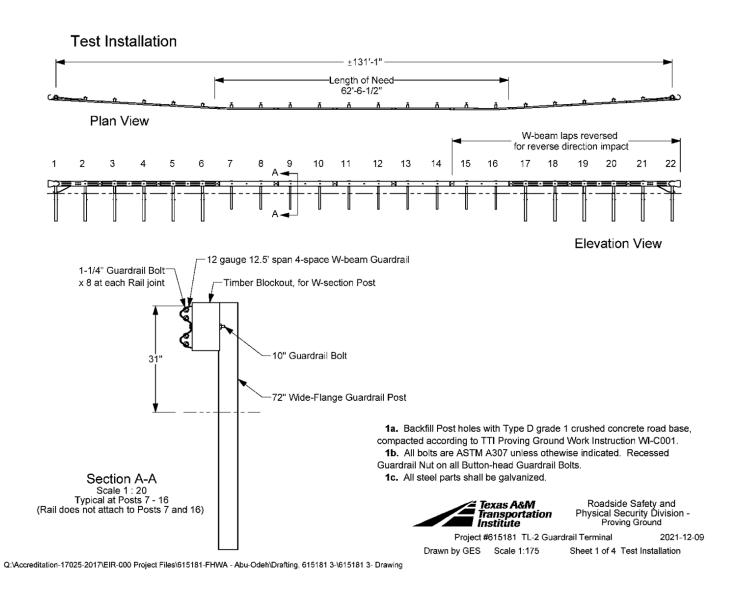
Details of TL-2 Terminal on MGS for Crash Test 615181-01-10.
